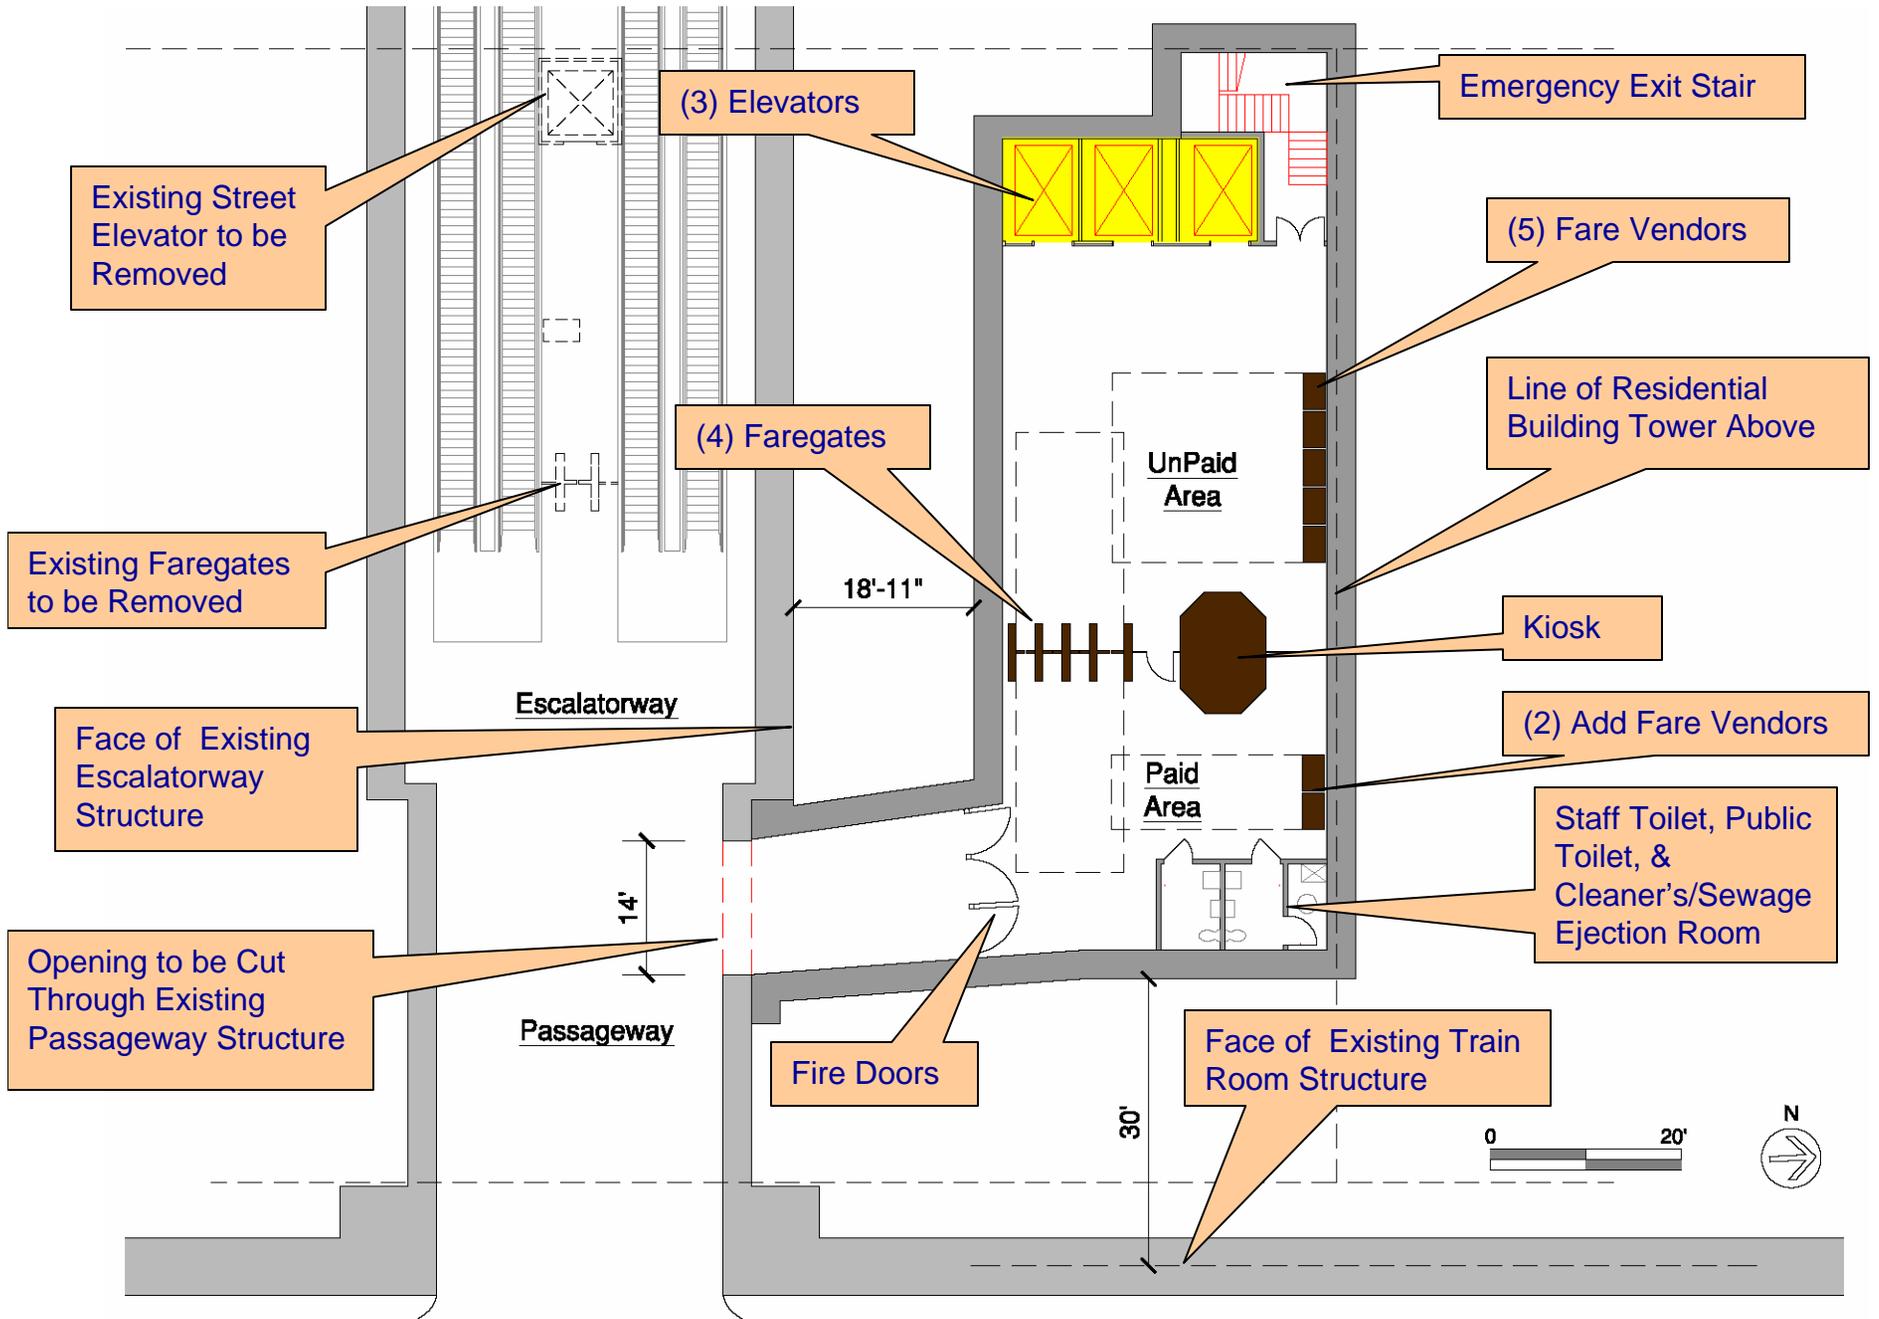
Alternative 1 - N. Lynn Street Level Plan
